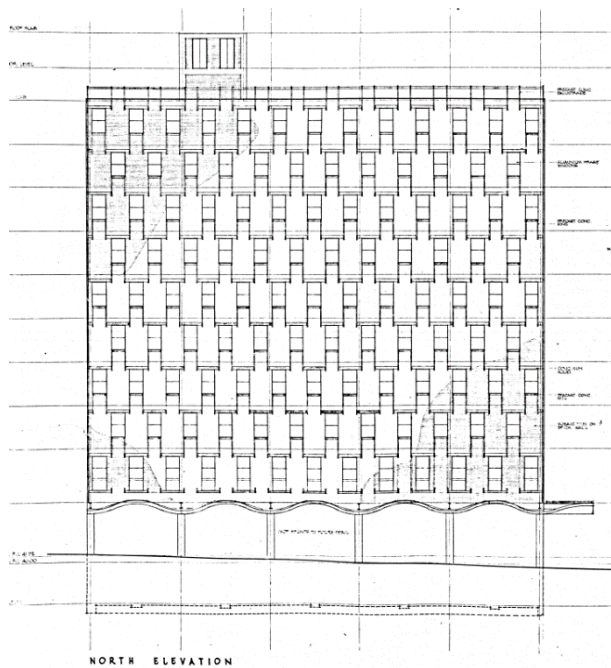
North elevation to Bourke Street. Drawing date stamped February 1963 (BAP).
